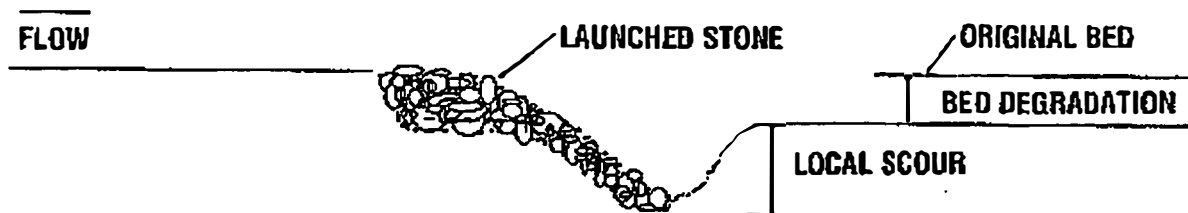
Typical section of mature headcut stabilization structure following degradation at toe.
